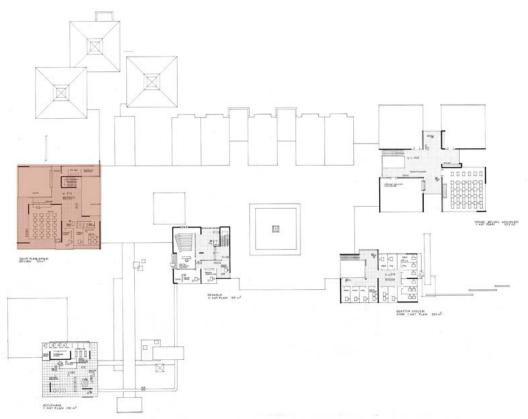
Altuğ, Behruz Çinici, Competition Entry, First Floor Plan, 1961.
